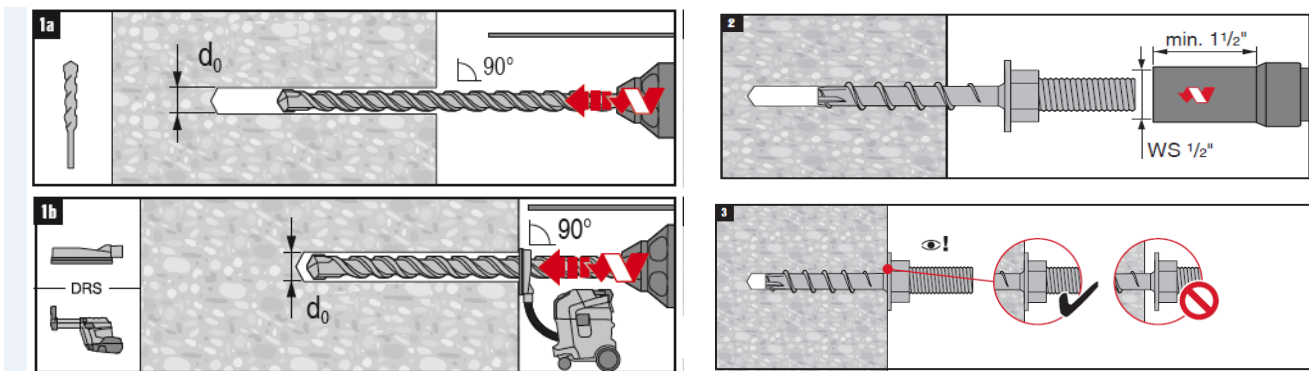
D—INSTALLATION INSTRUCTIONS – HILTI KH-EZ E SCREW ANCHORS
